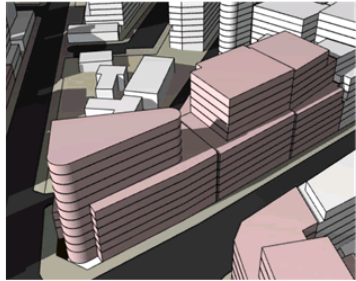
AREA D - BUILT FORM TESTING - EXAMPLE
